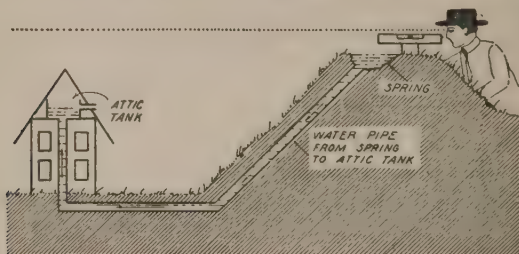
This shows how a farmer used a carpenter's level to find out whether water would run from a spring on a hill to a storage tank in the attic of his house. He could have built a higher house or one on higher ground and still the water would have run into the tank.
